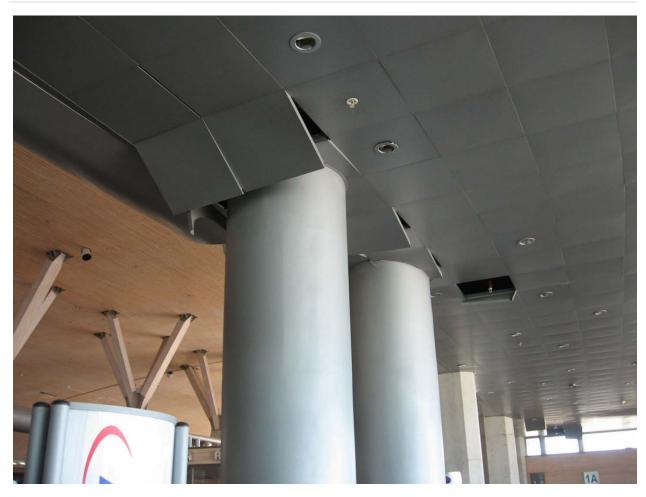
Damage to suspended metal panel ceiling system and fire sprinklers at Concepción airport, primarily at far end and around column obstructions in the 2010 Chile Earthquake (Photos courtesy of Rodrigo Retamales, Rubén Boroschek & Associates). The metal panel was strong enough to fail the sprinkler head shown at lower left.
